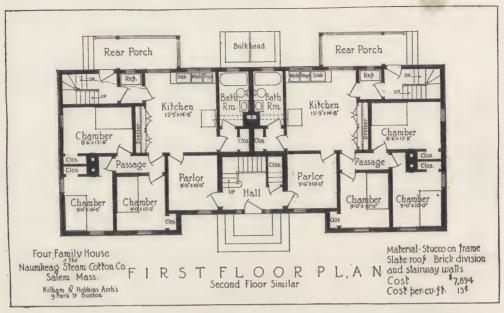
FLOOR PLAN OF FOUR-FAMILY HOUSE—MASSACHUSETTS HOMESTEAD COMMISSION HOUSES, SALEM, MASS.
